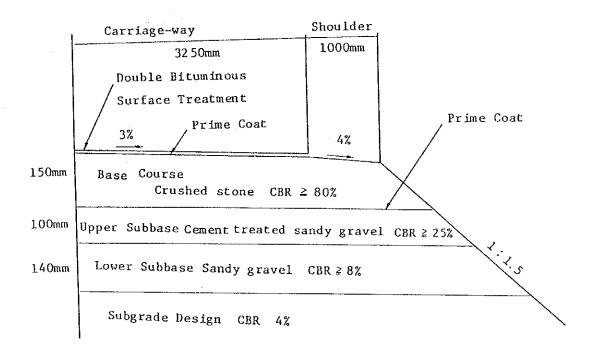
PAVEMENT DESIGN PROPOSED FOR LOT I
